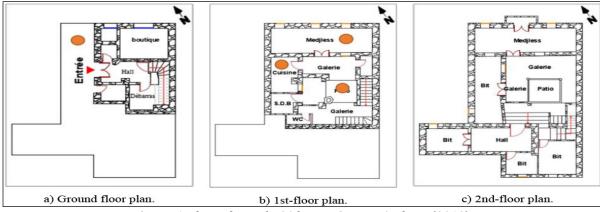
Floor plans of a 30 house. Source: Authors (2019).
